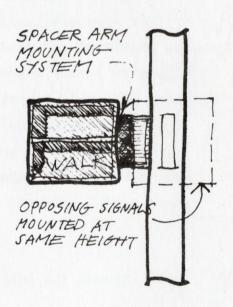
TYPICAL ELEVATION OF SIGNALIZATION/LIGHTING
